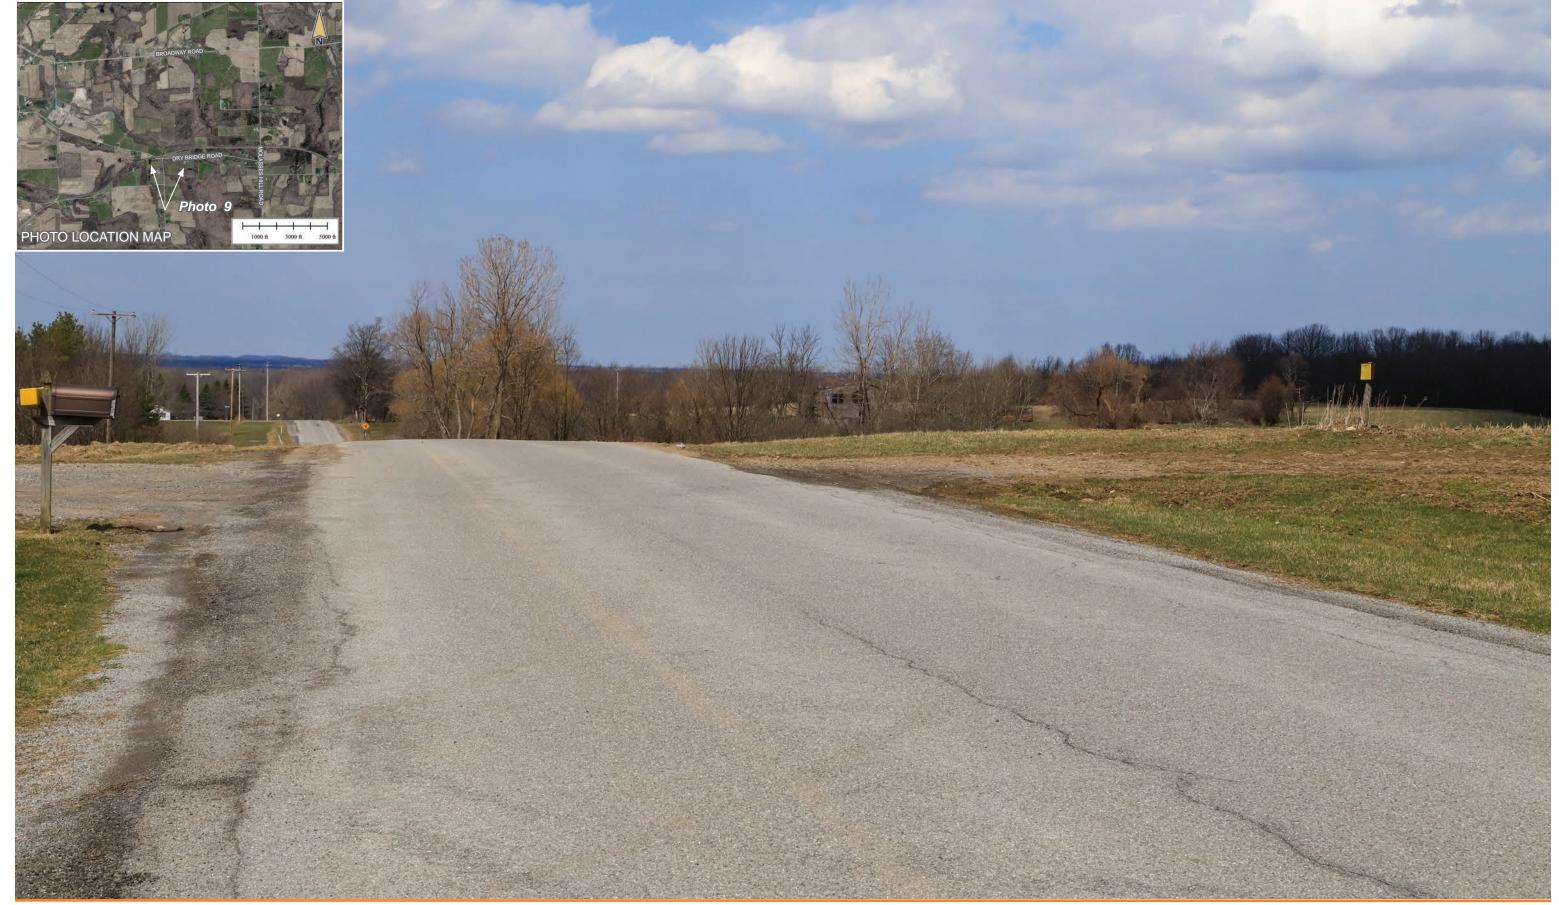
Chaddock Rd near # 11080 EXISTING CONDITION
